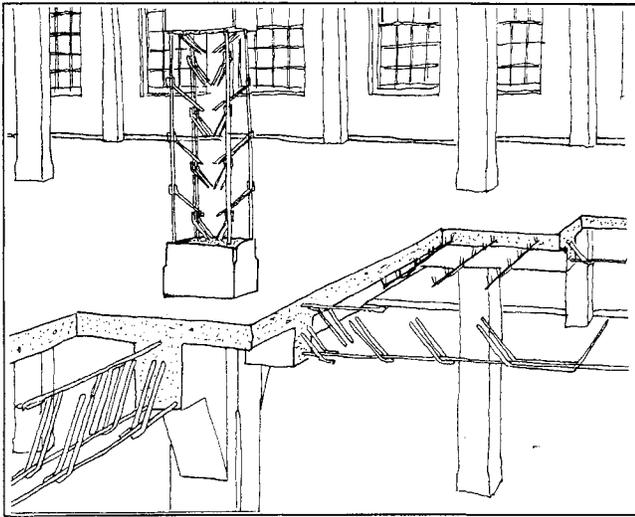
Kahn system of reinforced concrete, as used by Truscon, ca. 1904
